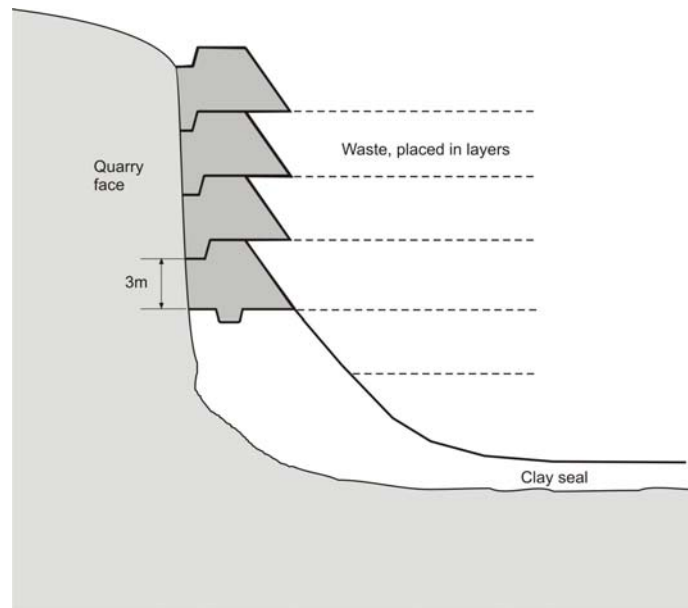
Cross-section through a ‘Christmas tree’ lining system
